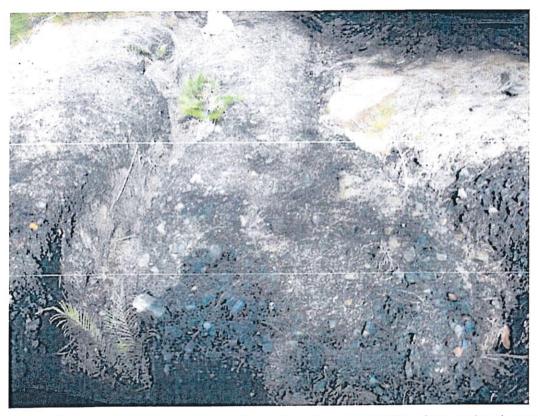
Close up picture of erosion pathway along the road shoulder, where coalwash was used.
